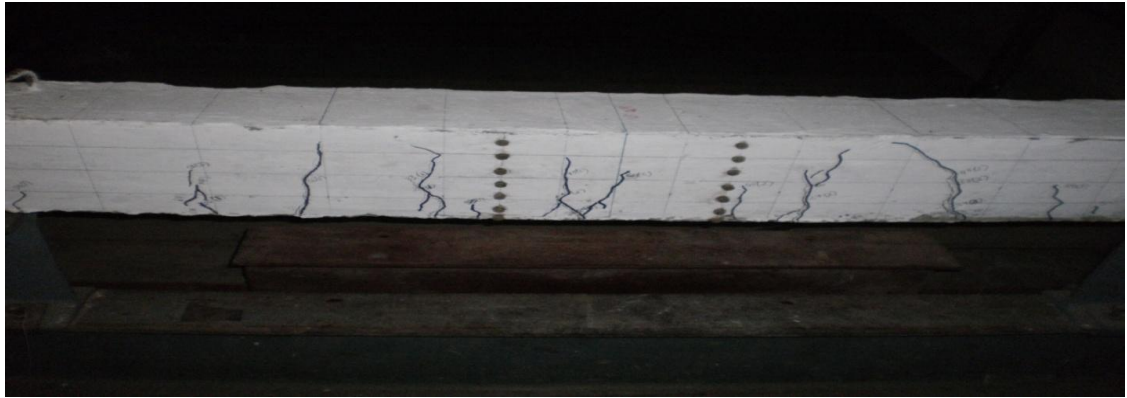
Crack Pattern of R₇ Beam under Flexure
